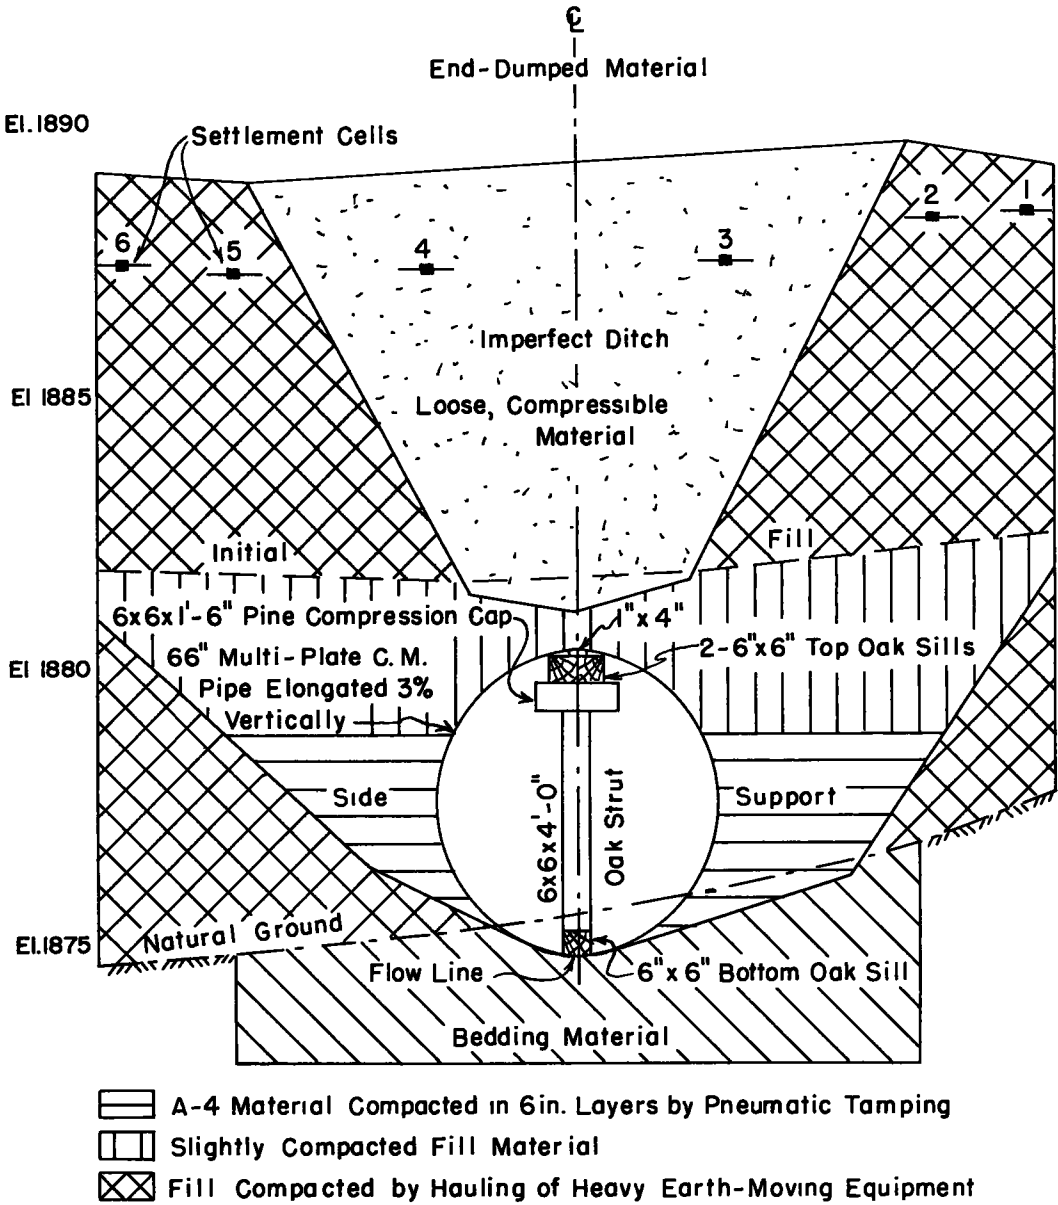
Typical cross section showing culvert installation. Obtained at Ring 31. Looking downstream.
